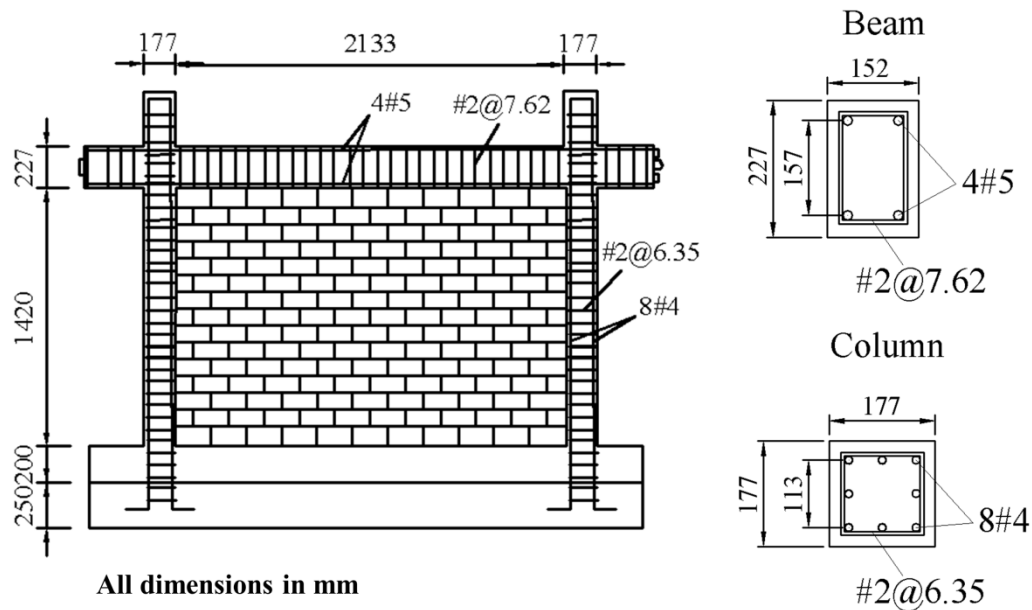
RC masonry-infilled frame: geometry and cross-sections (adapted from [11]).
